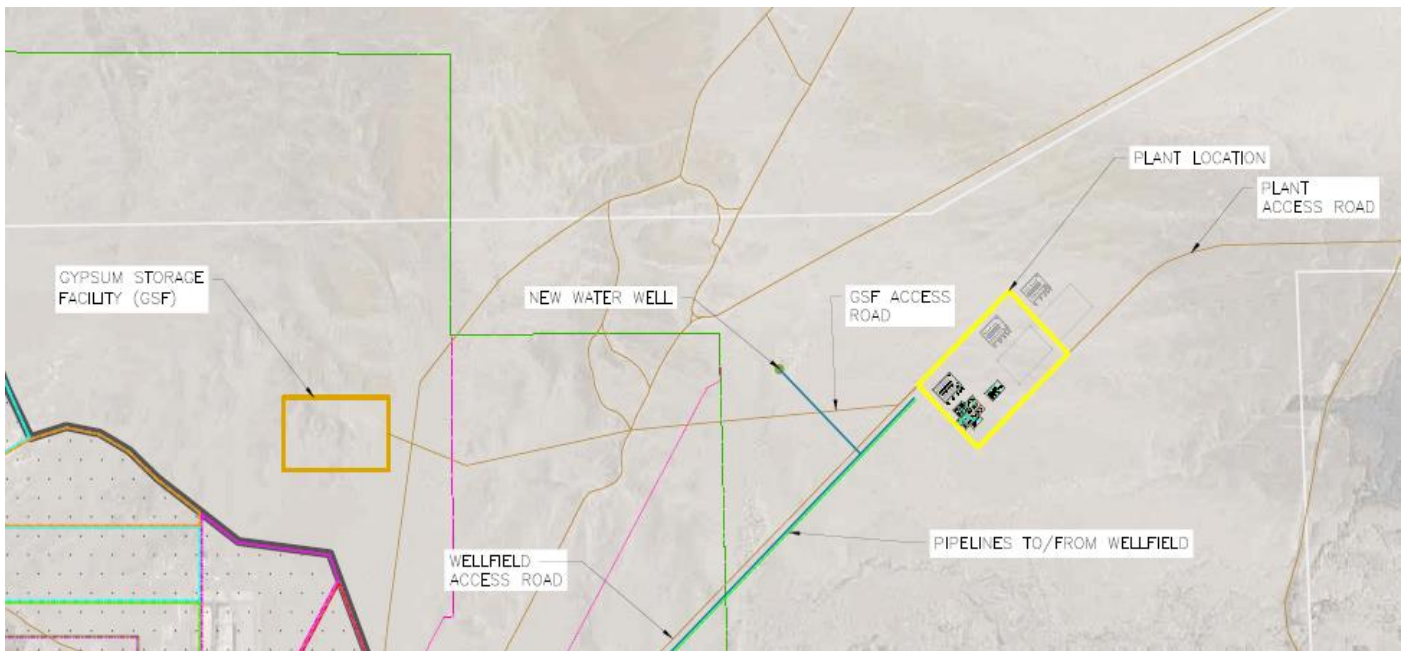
Site Layout (including phases 2 and 3) of Plant and Facilities
